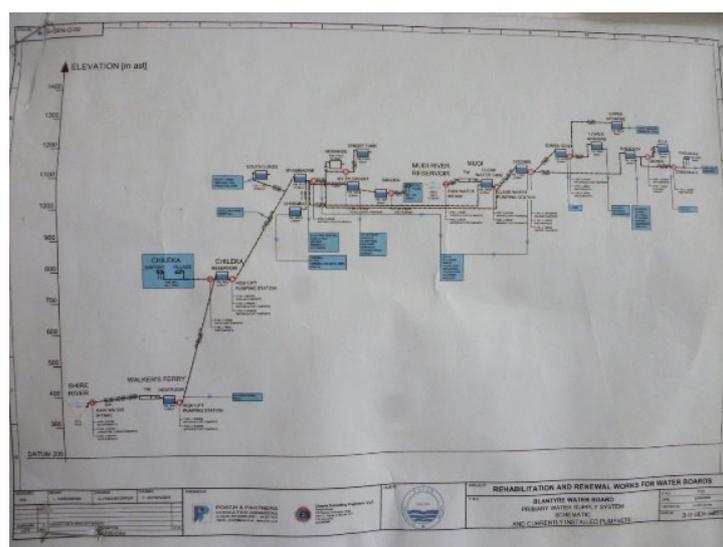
Drawing of elevation of Walker’s Ferry Water Treatment Plant and major reservoirs
